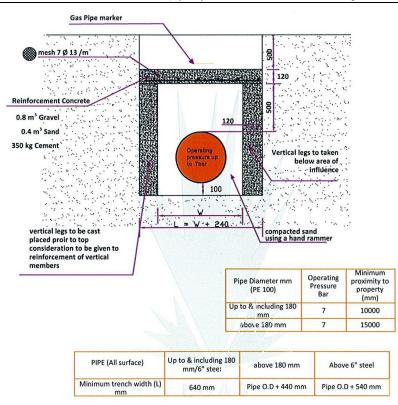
Typical layout of U-shaped concrete slab (Source: EGAS technical drawings)
